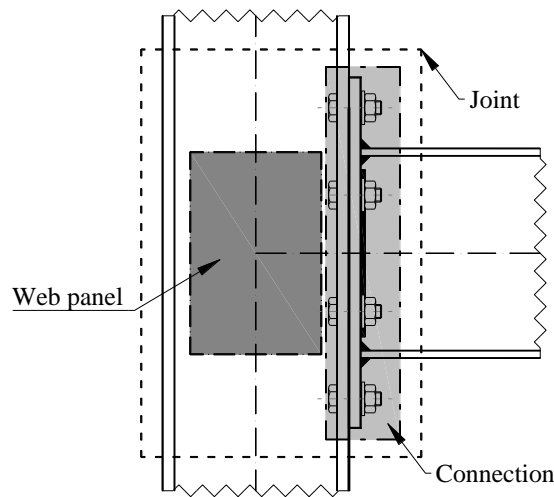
Division of a beam-to-column joint into zones (single-sided configuration).
